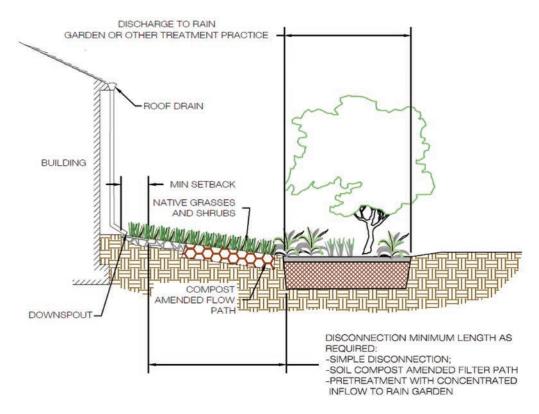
Residential Rooftop Disconnection to downstream raingarden – Bioretention without an underdrain (Source: VADCR).
